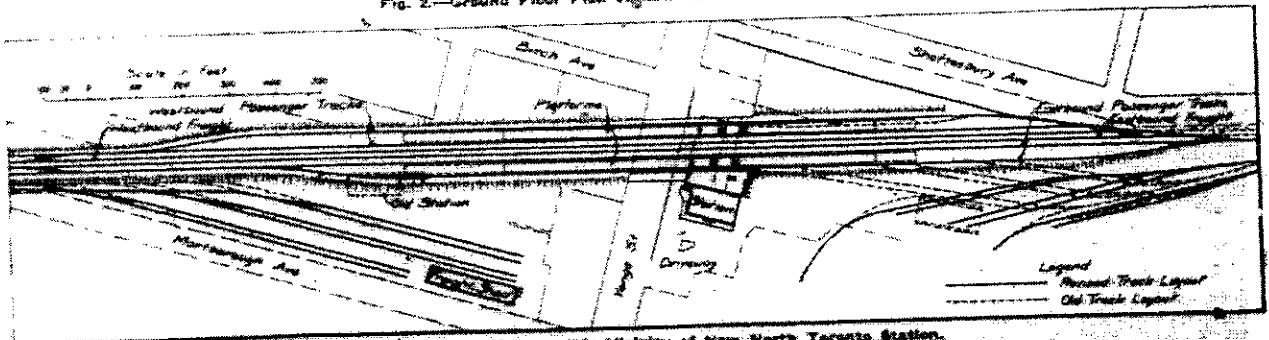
Track Arrangement in Vicinity of New North Toronto Station.
